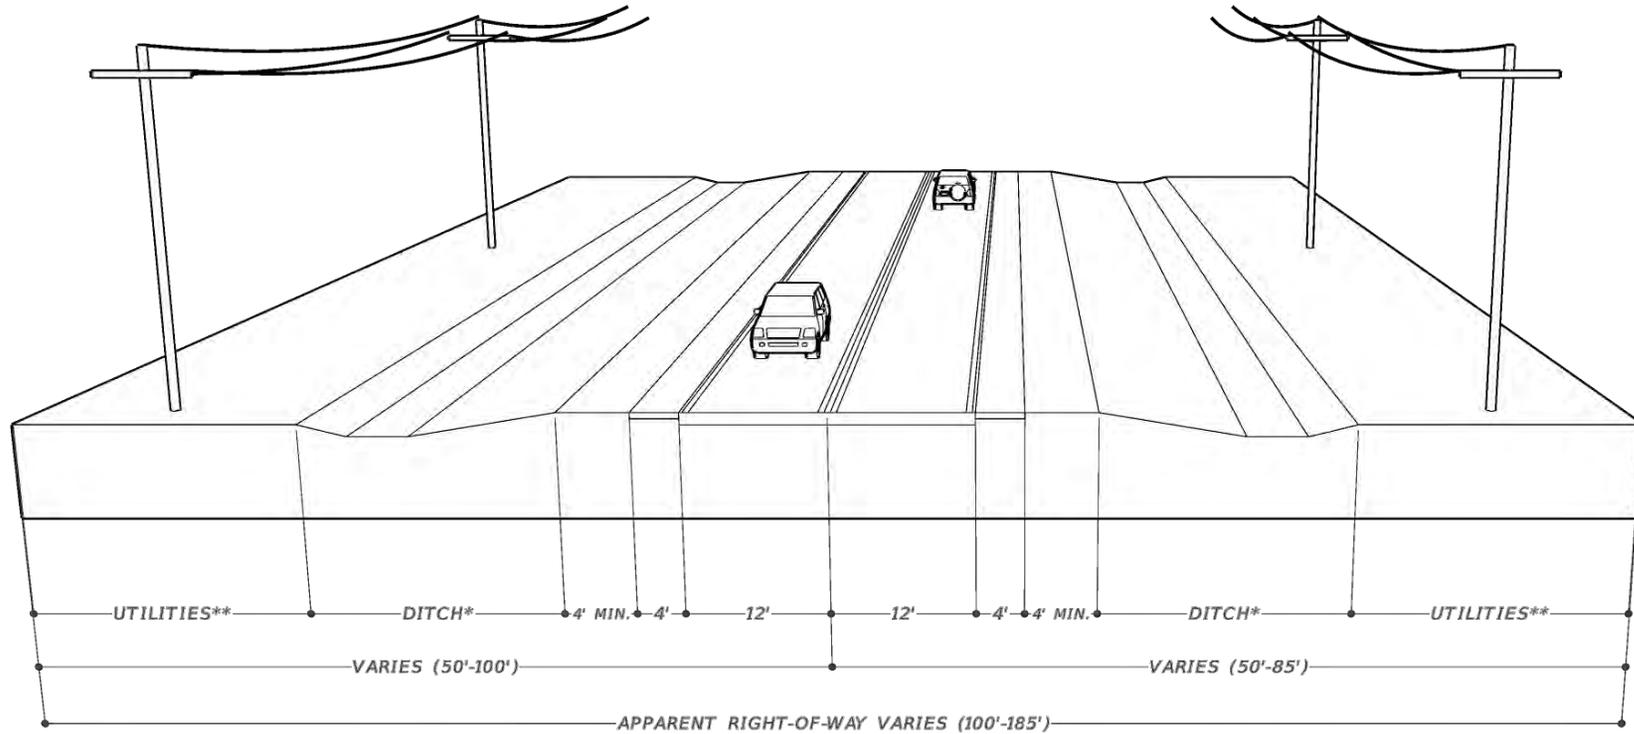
| Segment 1 - Existing Typical Section: Levy Hammock Road to Lake County in Marion County
